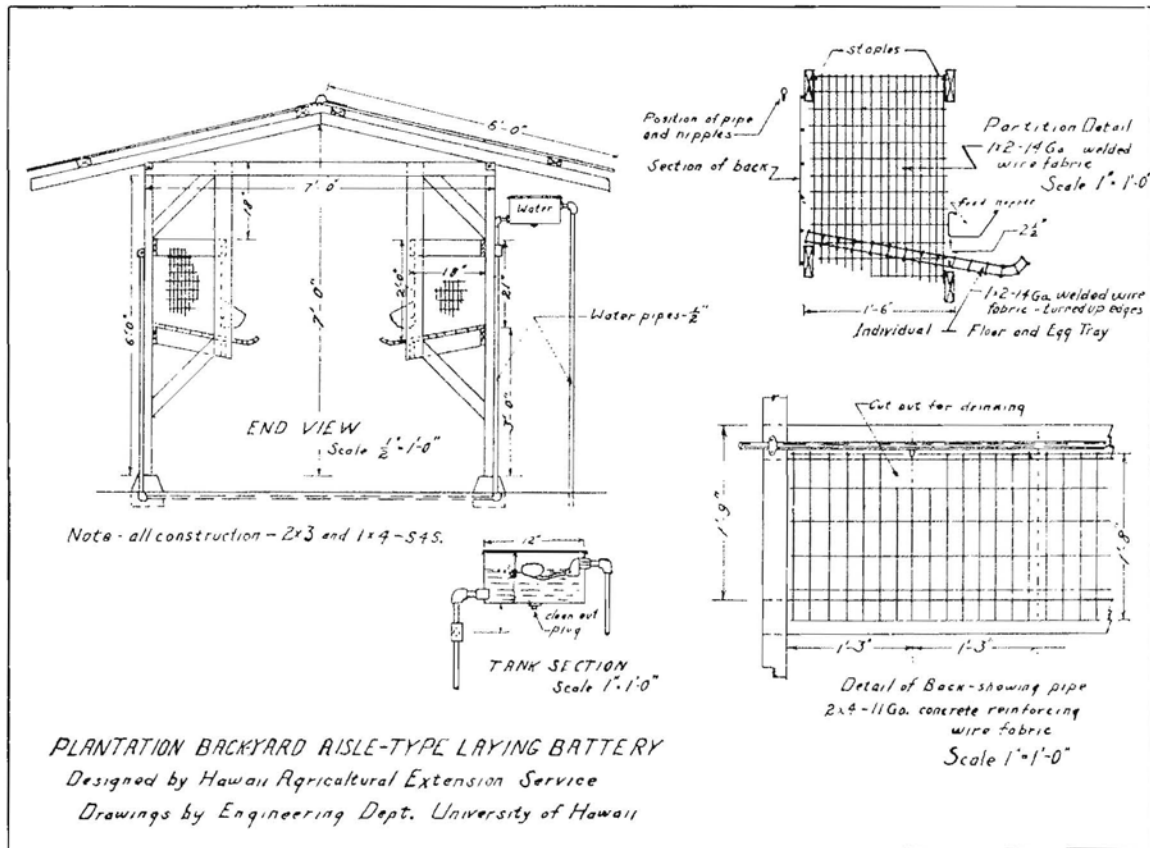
Plan for laying battery showing end view, partitions, nipple water system, and details of the pressure control water tank.
